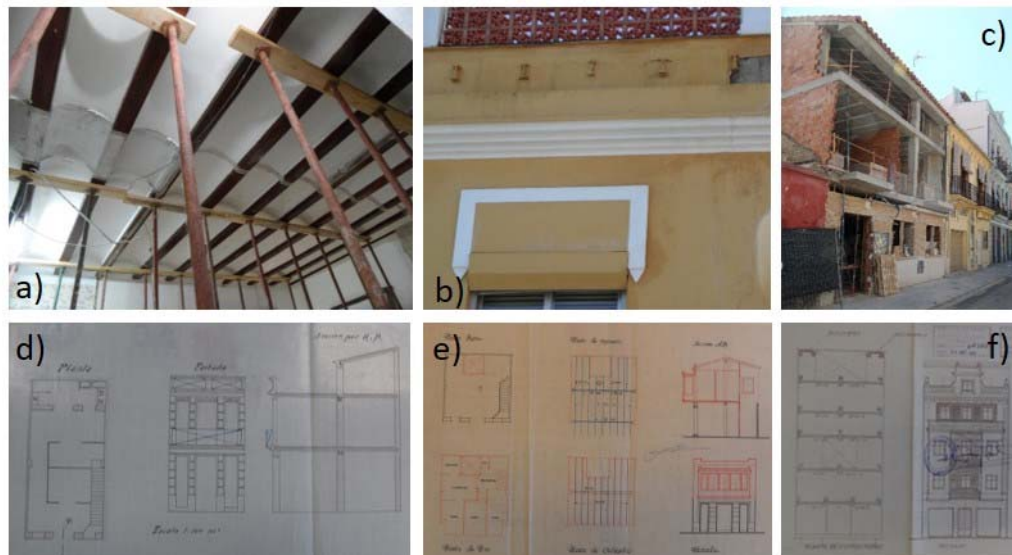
Structural typologies: a) URM timber floors, b) URM steel floors, c) RC framed structure (credit: the authors). Original plans of structural typologies d) URM timber floors, e) URM steel floors; f) RC framed structure (Source: Municipal Historical Archive of Valencia)
